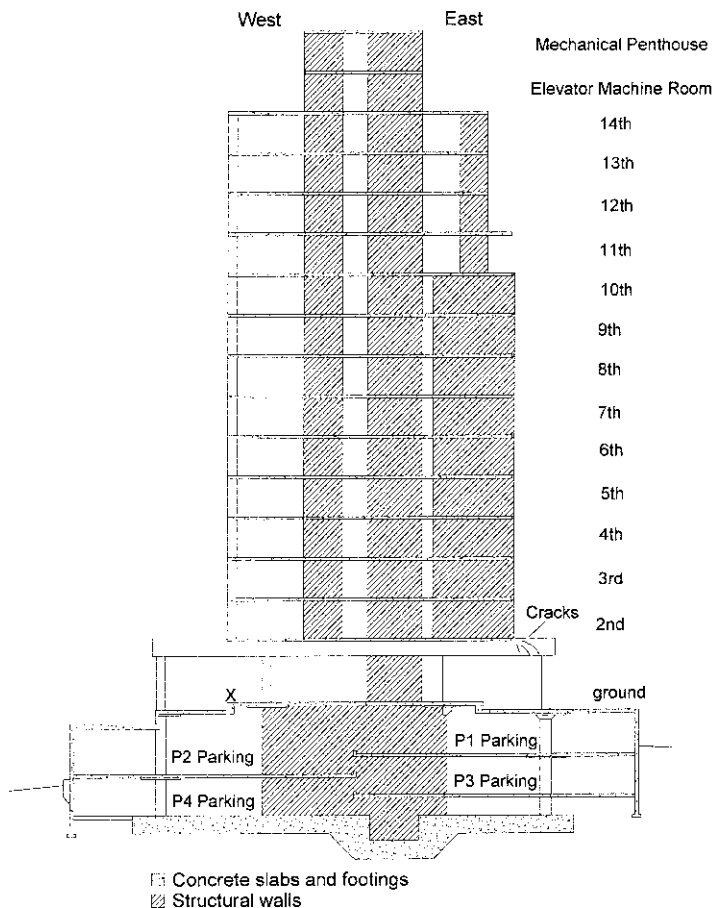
Structure in distress in Toronto area. Note cracks in transfer beam on right side of structure, 2nd floor
